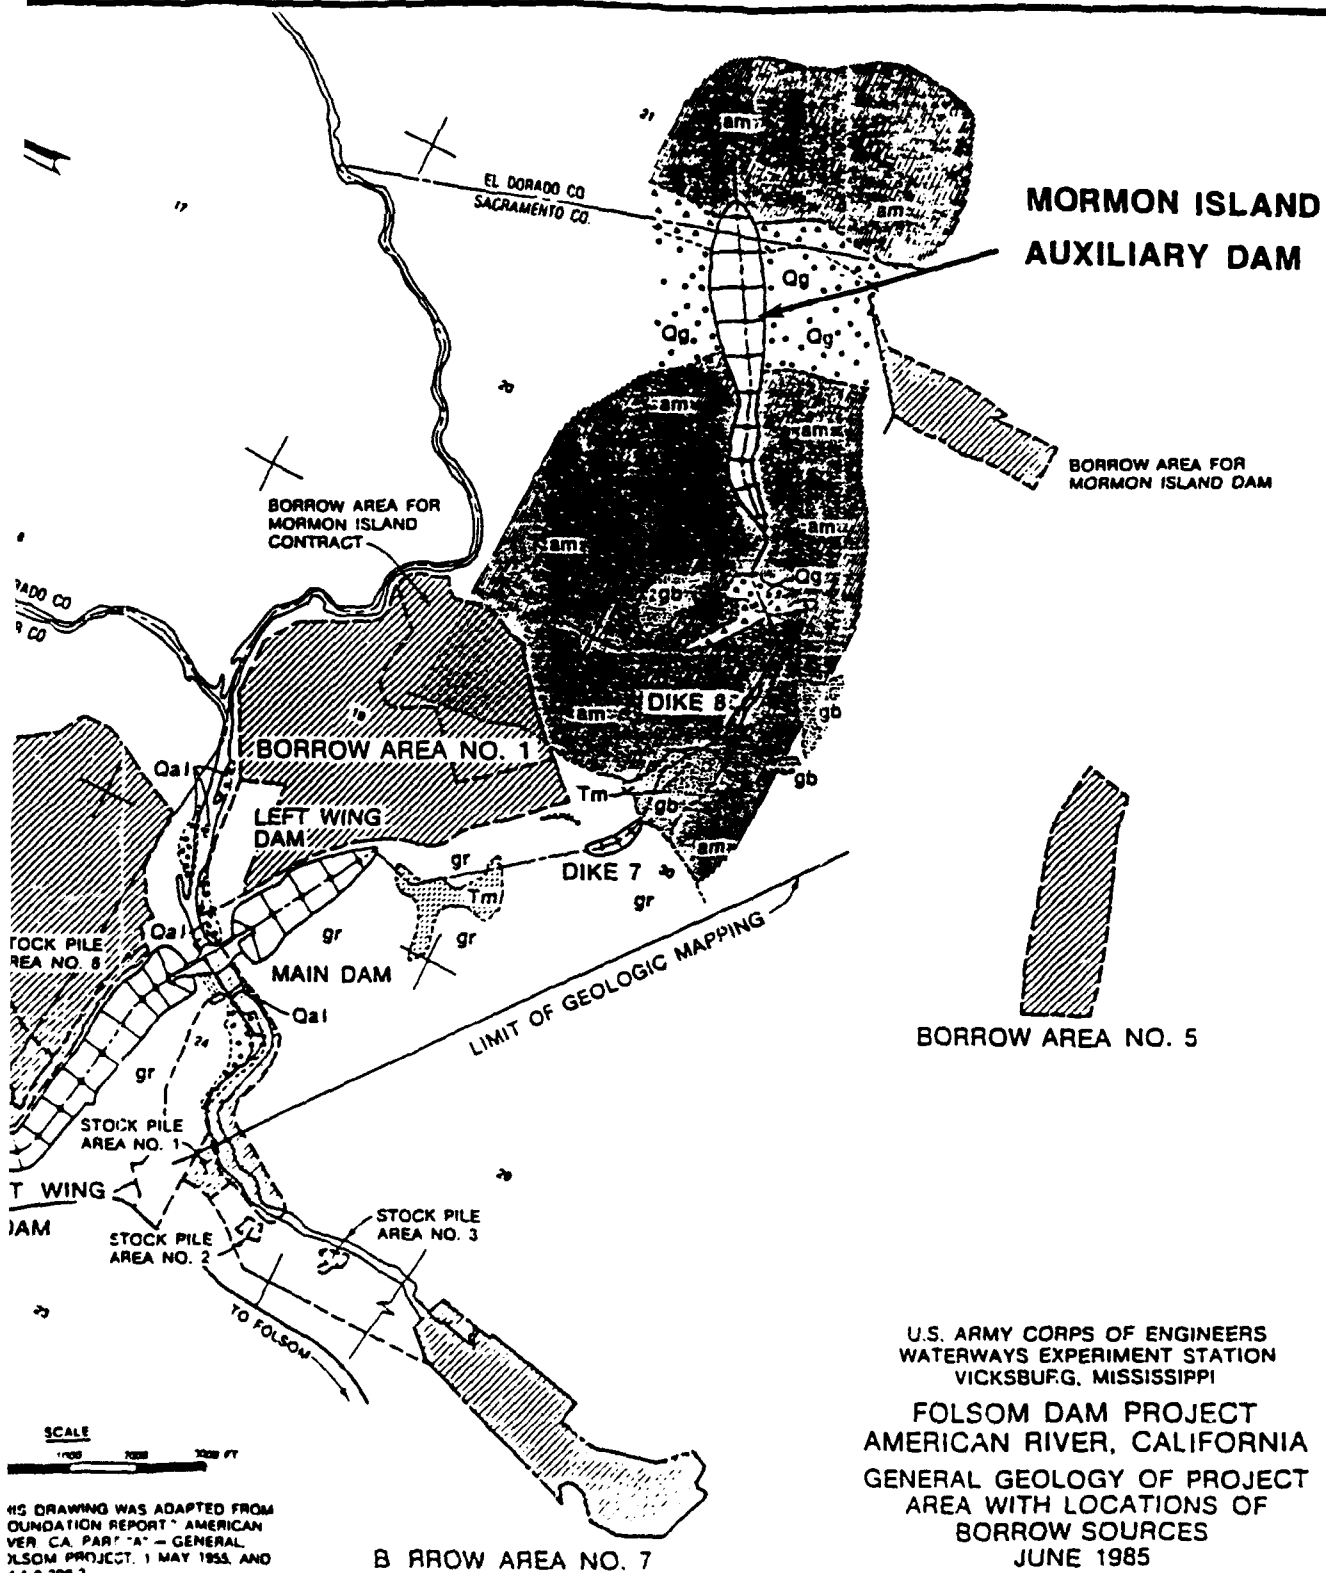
Plan of man-made retaining structures at Folsom Dam Project
